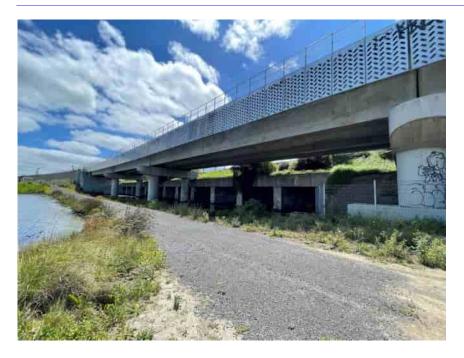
Access Track (gravel) downstream of the Footscray Rail culverts (photo taken in 2023).
